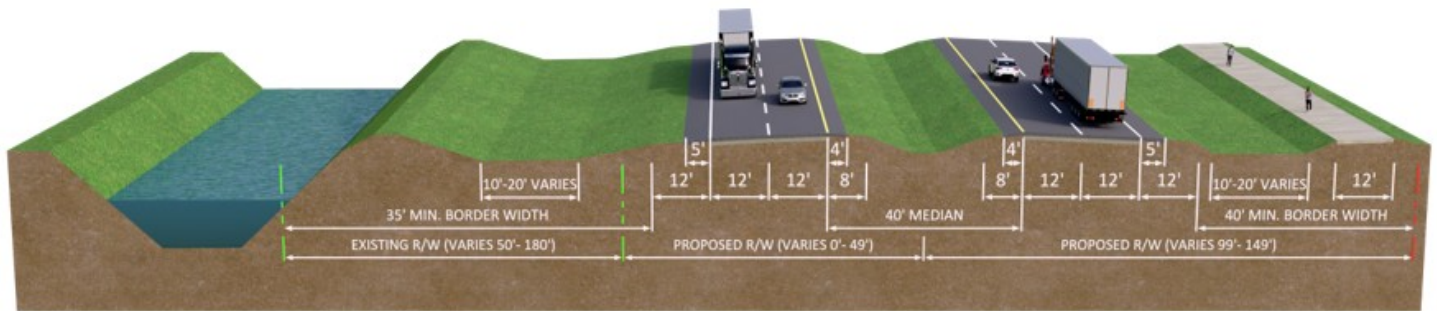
Preferred Alternative Roadway Typical Section: For FPID 414506-5-22-01 Showing Widening to the South; Also Approximately 1500 feet East of Indian Prairie Canal (C-40) to Approximately One-Half Mile West of C.R. 721
